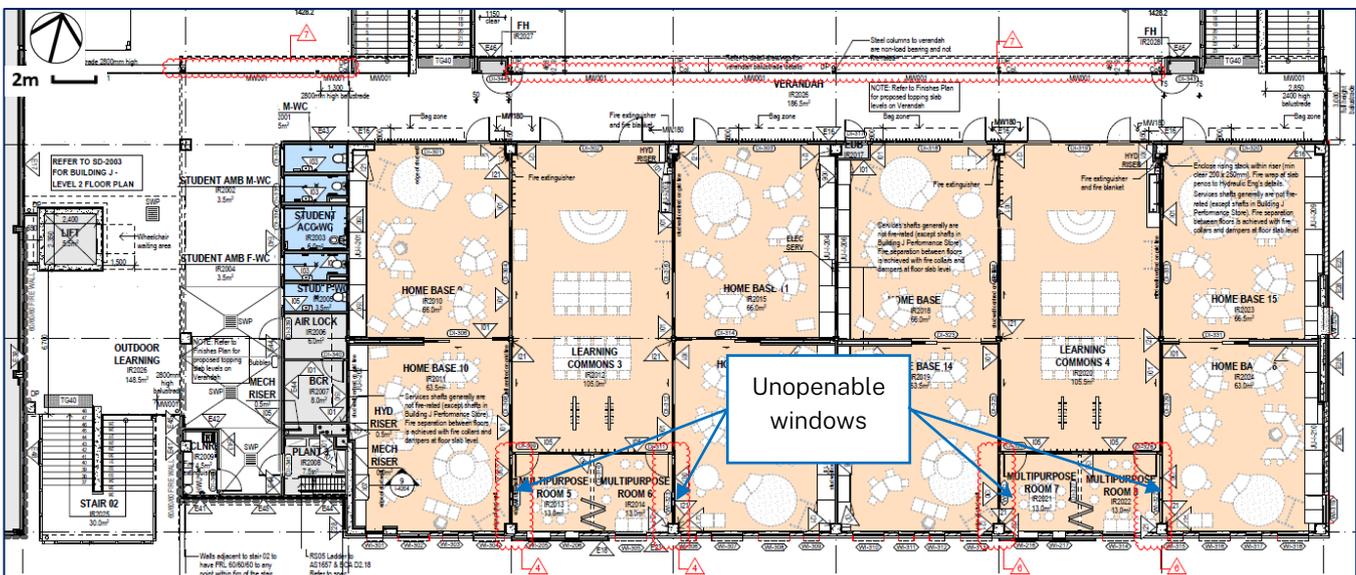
| Proposed level 3 floor plan of Building I (Base source: Modification 3, 2023)
